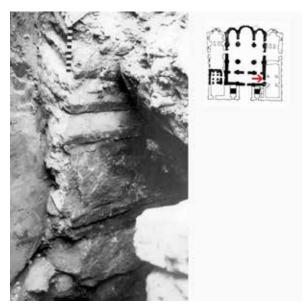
The Dormition Cathedral. Excavation site no. 18 a. East corner of the opening in the basement of the south wall of the narthex. Photo: [in:] Collection of the Ukrrestavratsiia Corporation
